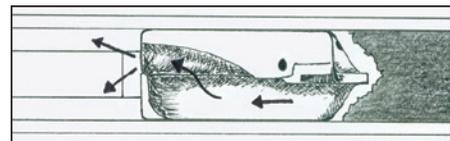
HydroDrill™ cleaning with rotating brush or drill bit.
